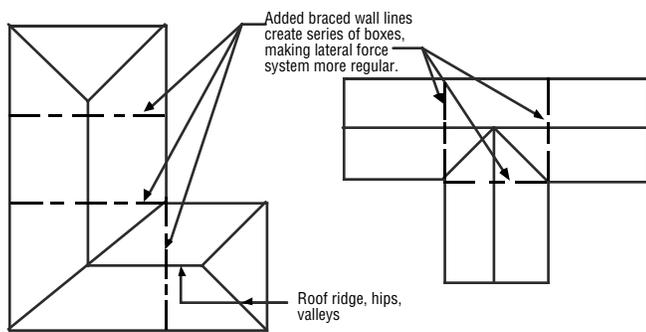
T- and L-shaped buildings. Added braced wall lines provide conventional “box” bracing system.
